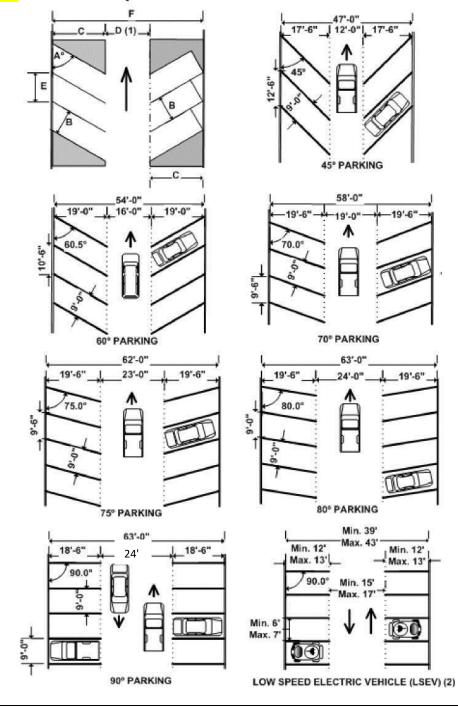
A.1.D – Typical Example of General Parking Schematic ⁽¹⁾
